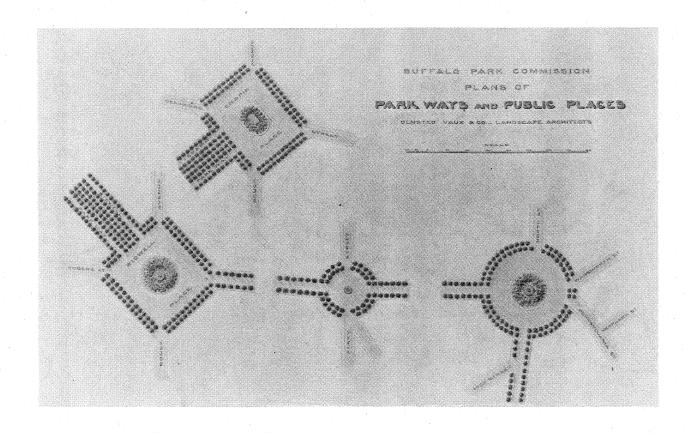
Parkways and Public Places, Buffalo Park Commission, Olmsted Vaux & Company, Landscape Architects. Courtesy Beveridge collection.
